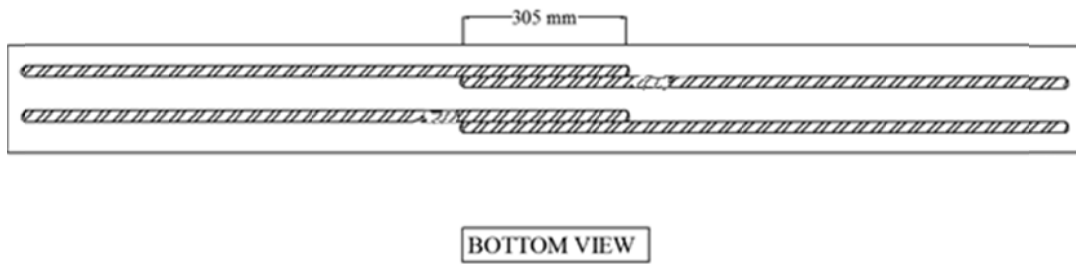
Bond Beams - Reinforcement Details; all dimensions are in mm.
